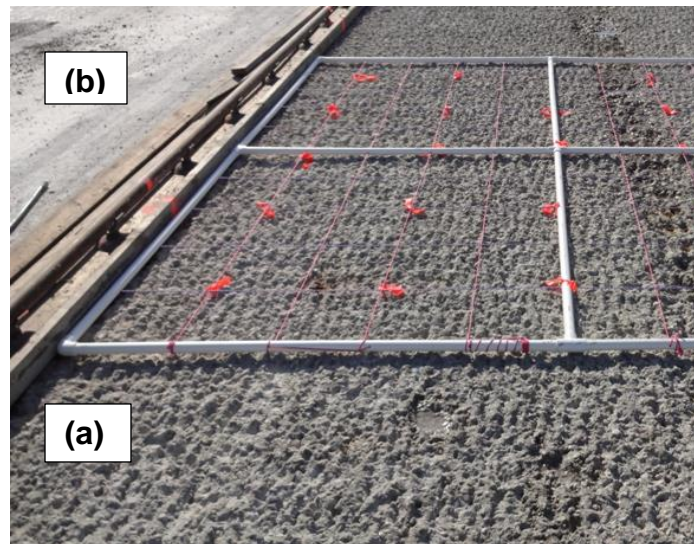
Rough, grooved concrete surface caused by milling (a) and original as built concrete surface (b).
